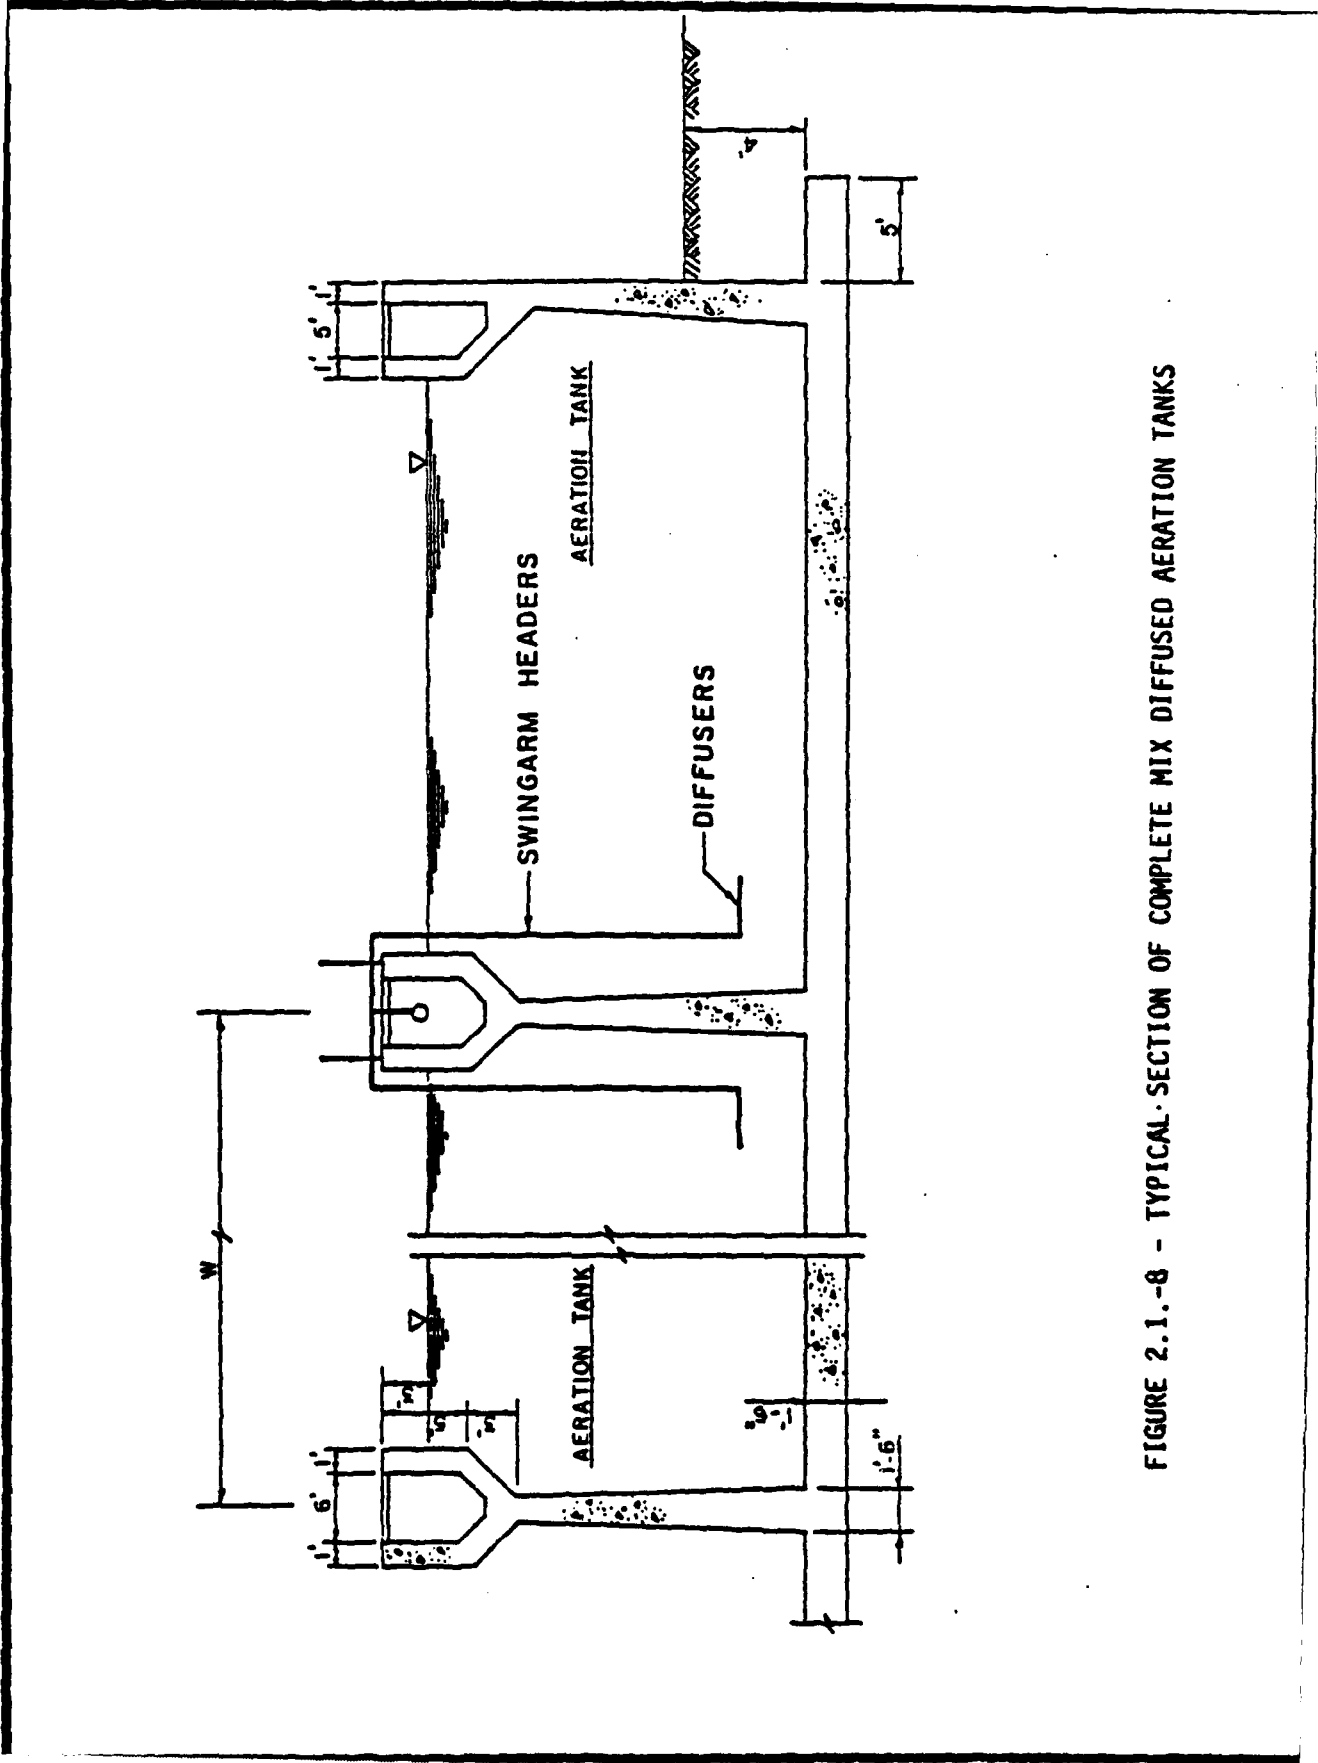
8 - TYPICAL SECTION OF COMPLETE MIX DIFFUSED AERATION TANKS
